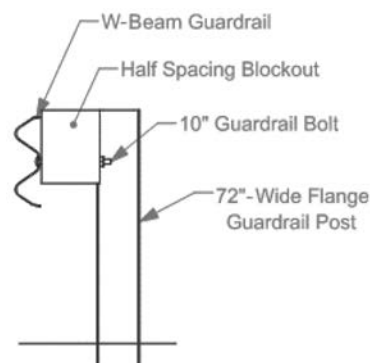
Profile view of MGS with half-post spacing and shortened 10-inch blockout with W-beam rail (7).
